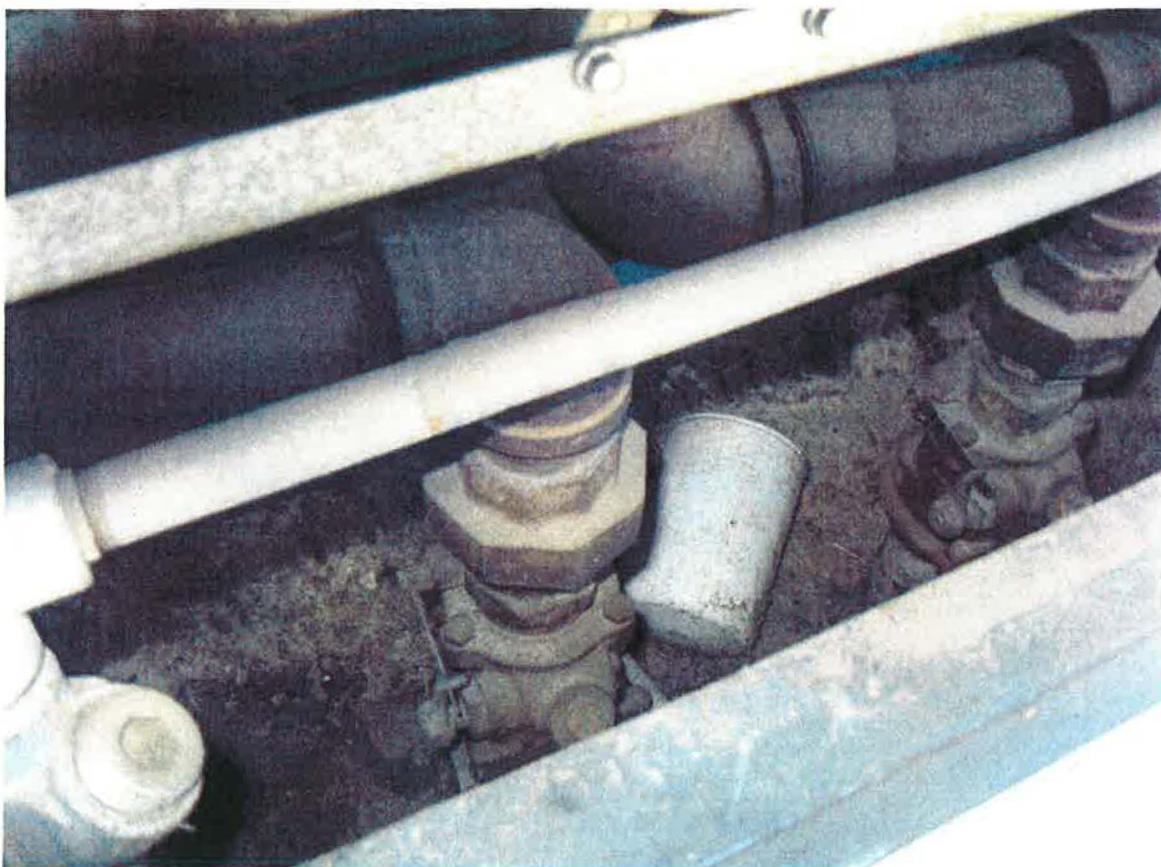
Dispenser #3 & #4 with shear valve observed. No dispenser pan. Piping was confirmed to be fiberglass going into the ground.
